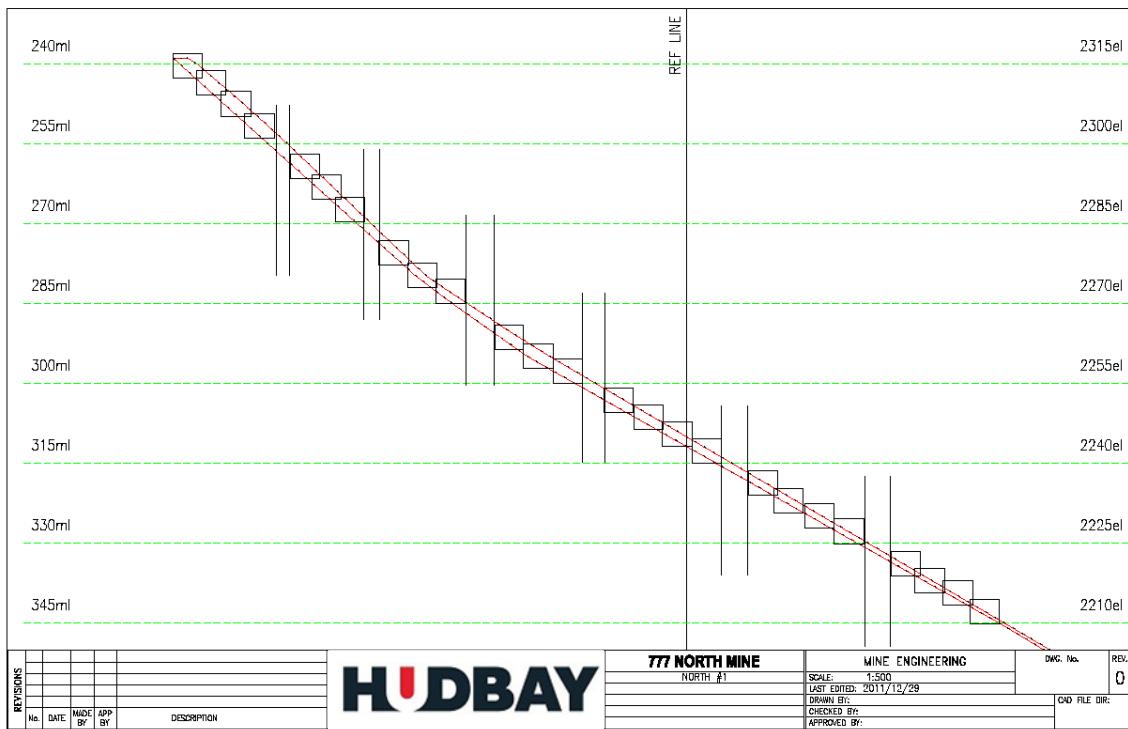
Cross Section of 777 North Expansion Cut and Fill Mining Method
